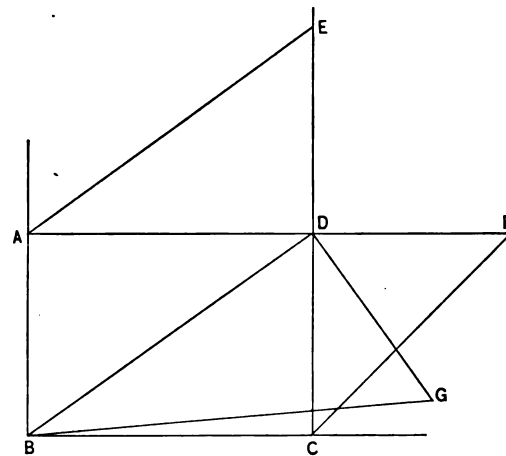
Plan of Corner Portion of a Roof having Two Pitches.
